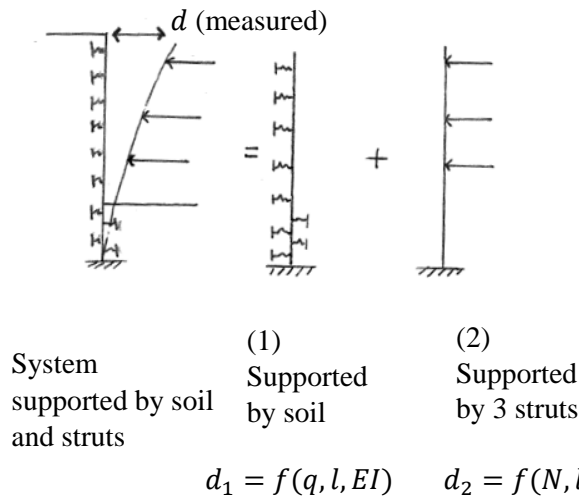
Behaviour of the sheet pile wall subdivided in (1) supported by soil and (2) supported by struts.
